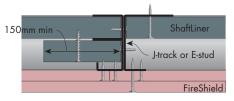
Section B-B Lift Landing Door Example Only – Plan view
